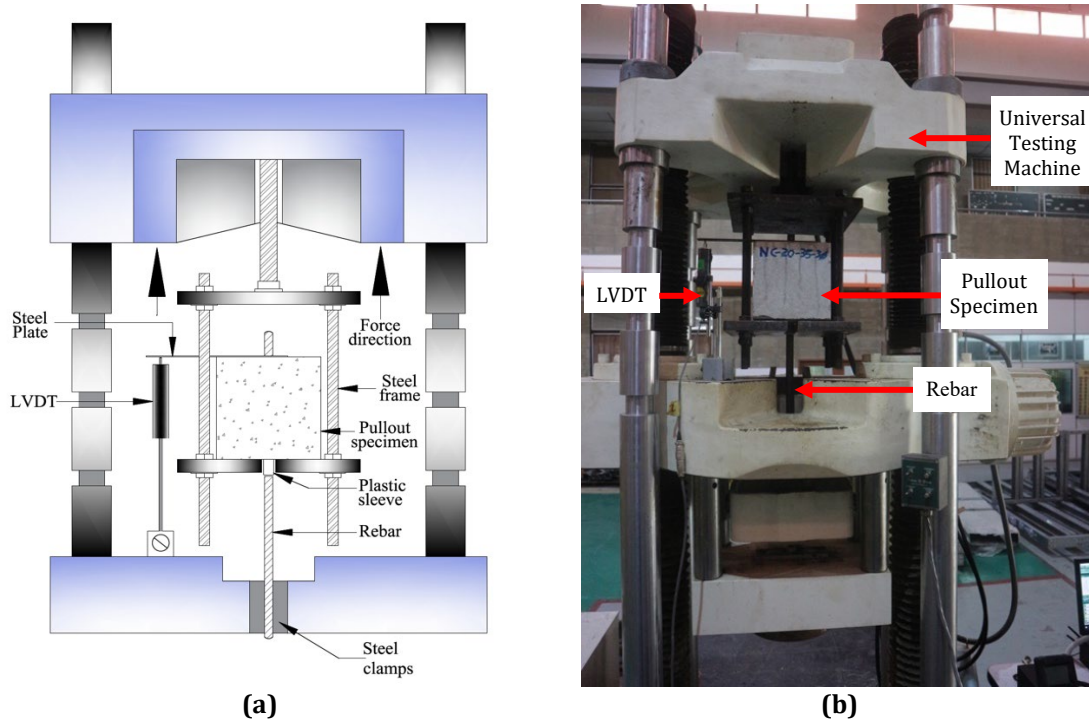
Pullout testing: (a) Details of direct pullout testing setup for cube pullout specimen; and (b) Direct pullout testing using universal testing machine
